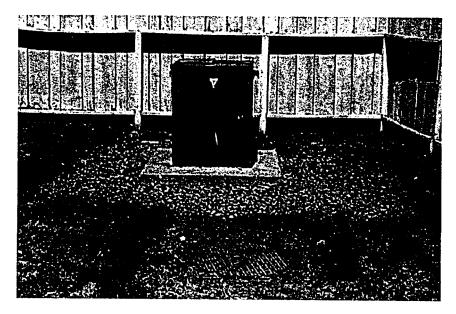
Power box and manhole cover looking north from site manager's house. Photograph by R. Hetzler, SUNY ESF, 2001.
